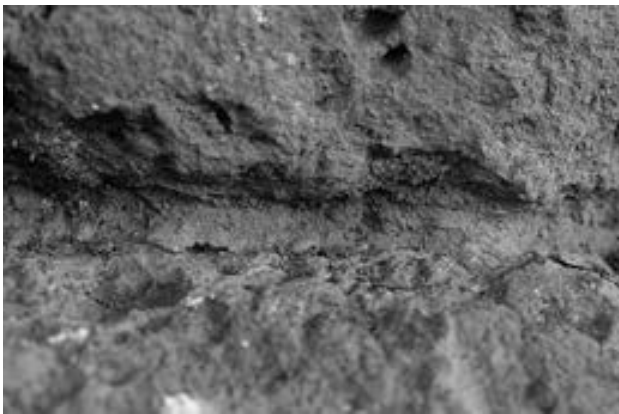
Filling between the blocks. The filling differs visibly from the surrounding tufa blocks. Photograph by M. Klingspor Rotstein.
